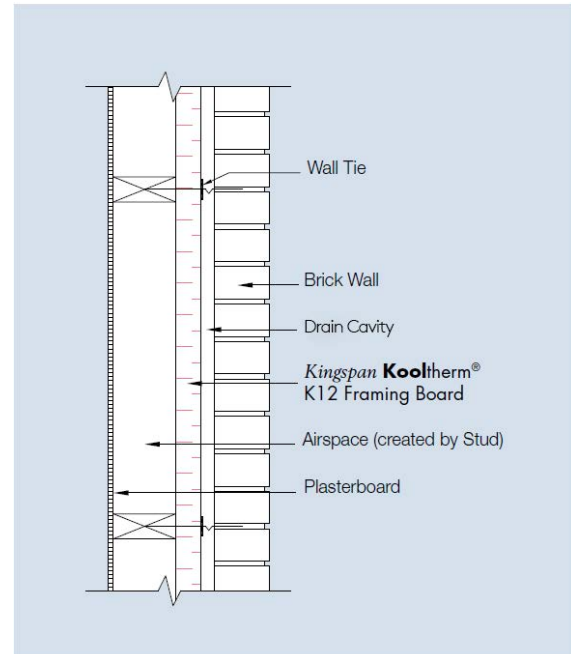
Brick veneer wall with Kingspan Kooltherm® K12 Framing Board.
